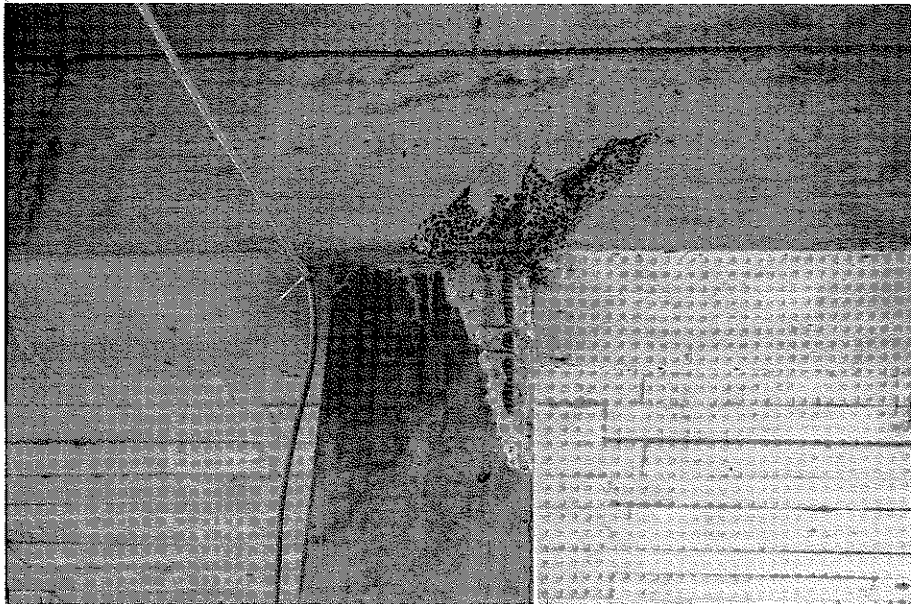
Spalling at beam-wall connection at the fifth story, Indian Hills Medical Center.
